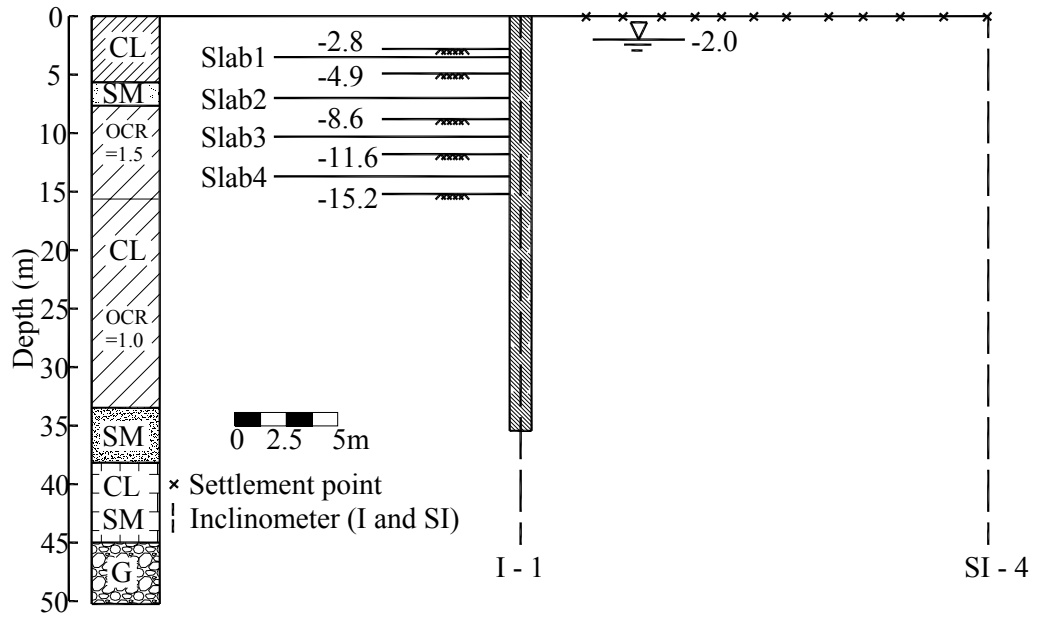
Excavation section view of TNEC excavation, modified after Ou et al. (1998)
